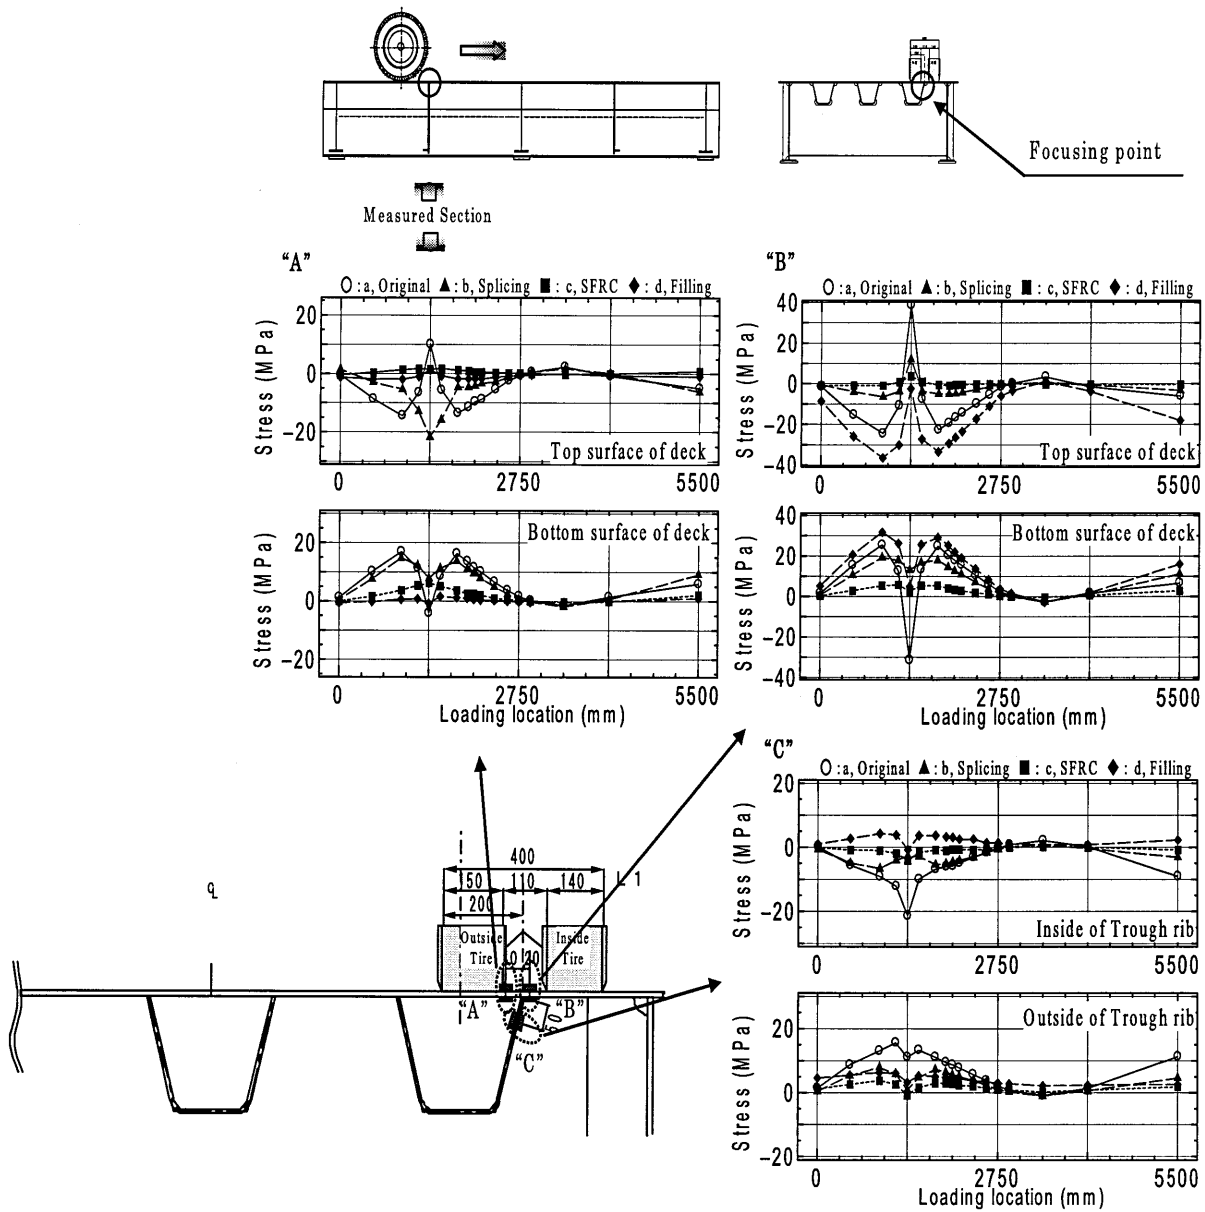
Stress on deck plate and trough rib close to welded joint (at mid-span of longitudinal rib)
